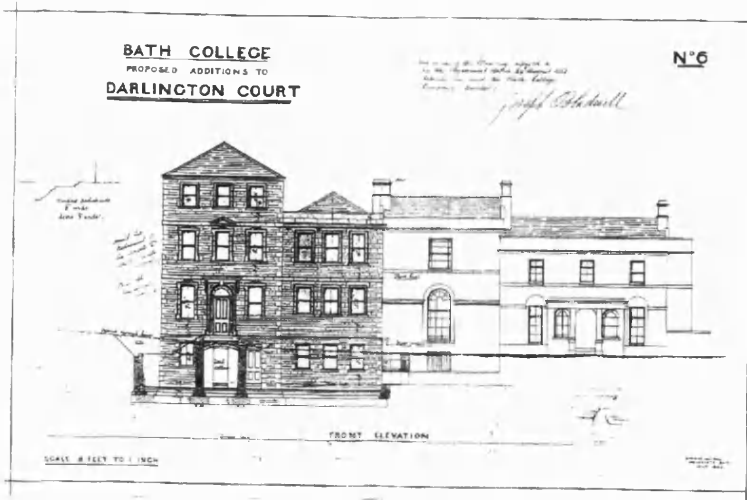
(upper left) Bath College, elevation to North Road with adjacent houses.
